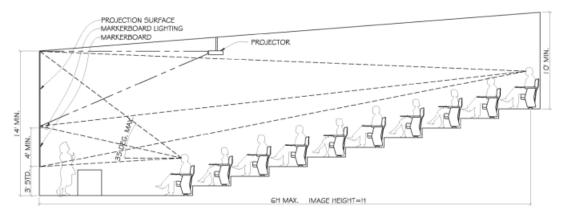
Tiered-Floor room section with wall projection, with standard measurement (UIT, 2020)
